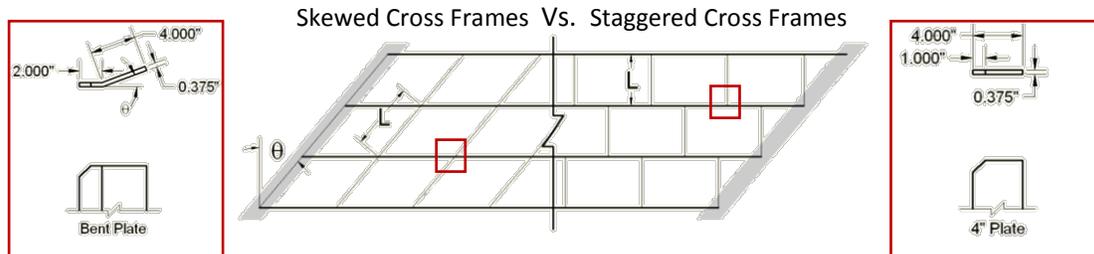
Cross-frame layouts and connection stiffener geometries for bridge analyses
